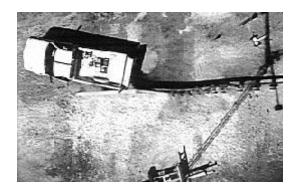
Sequential photographs for test 404211-3 (overhead and frontal views).
